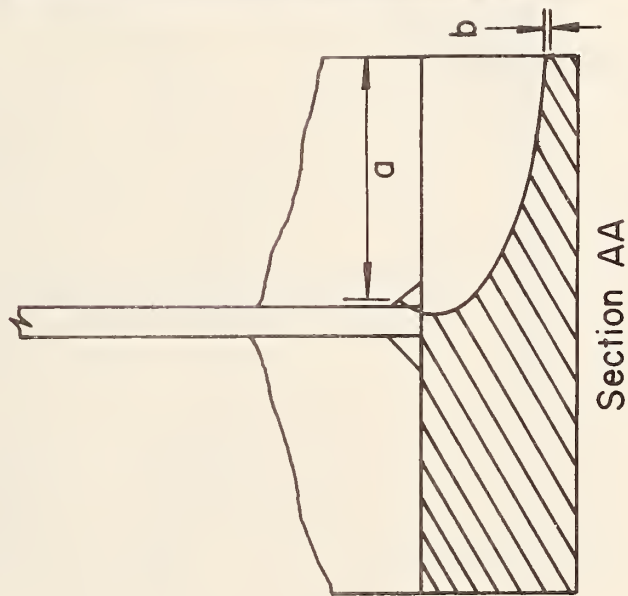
Fatigue and Fracture Surface, B7A (A514)
